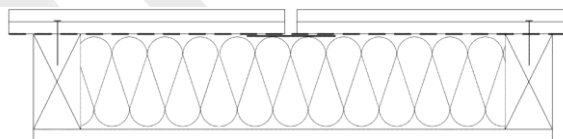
Hardboard cladding board expansion gap with Concealed Joiner
